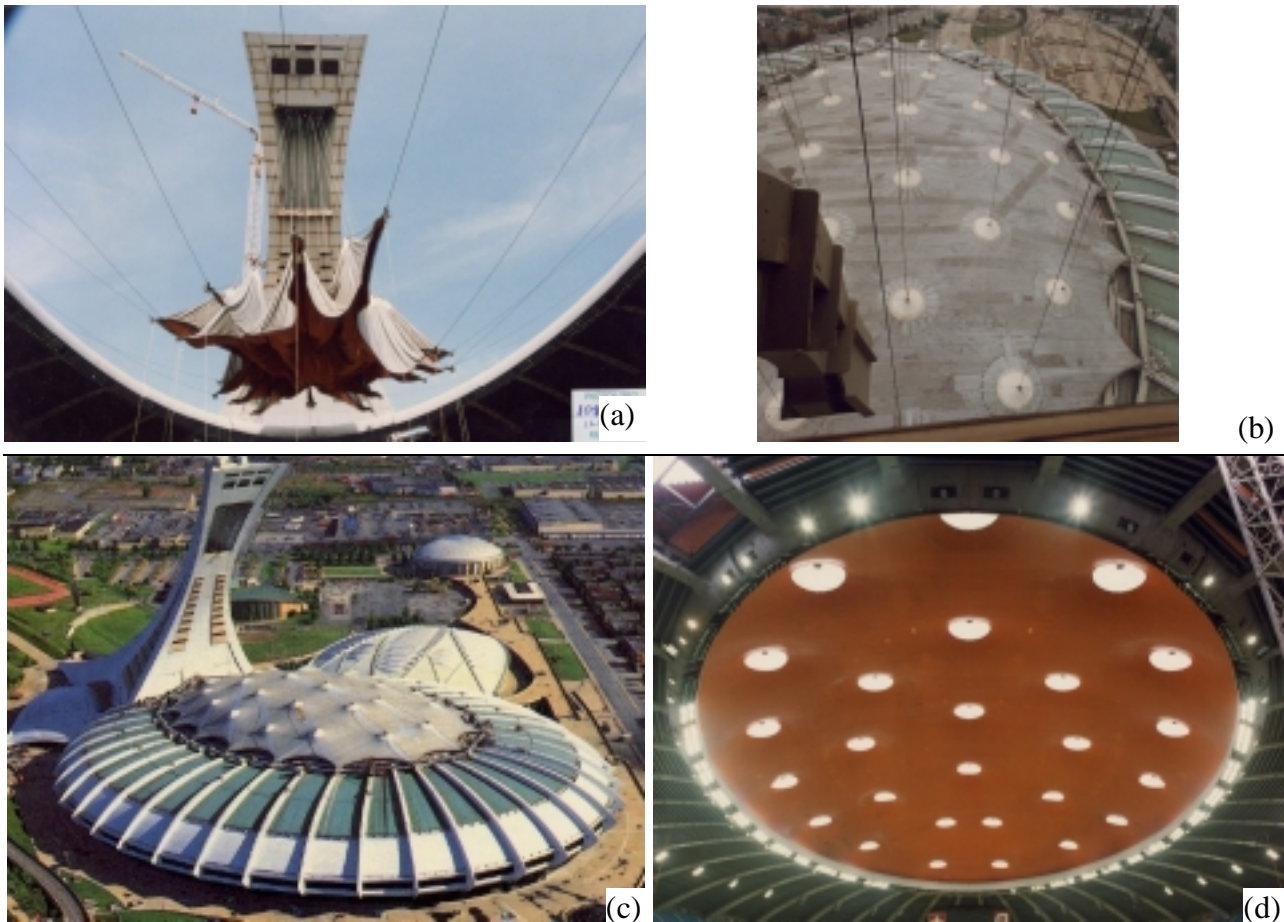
(a) opening of the membrane, (b) suspension system (suspension cables, connection cables, perimeter cables and membrane), (c) and (d) outside and inside of the roof
